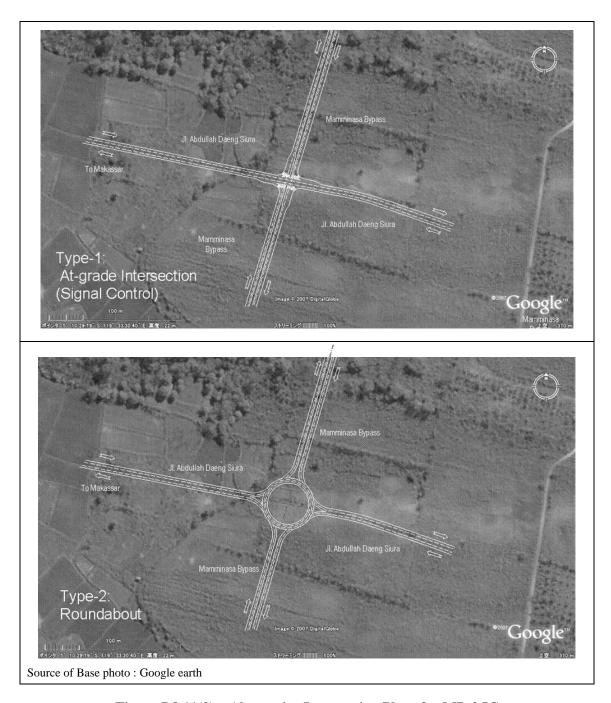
(2) Alternative Intersection Plans for MB-2 IC
